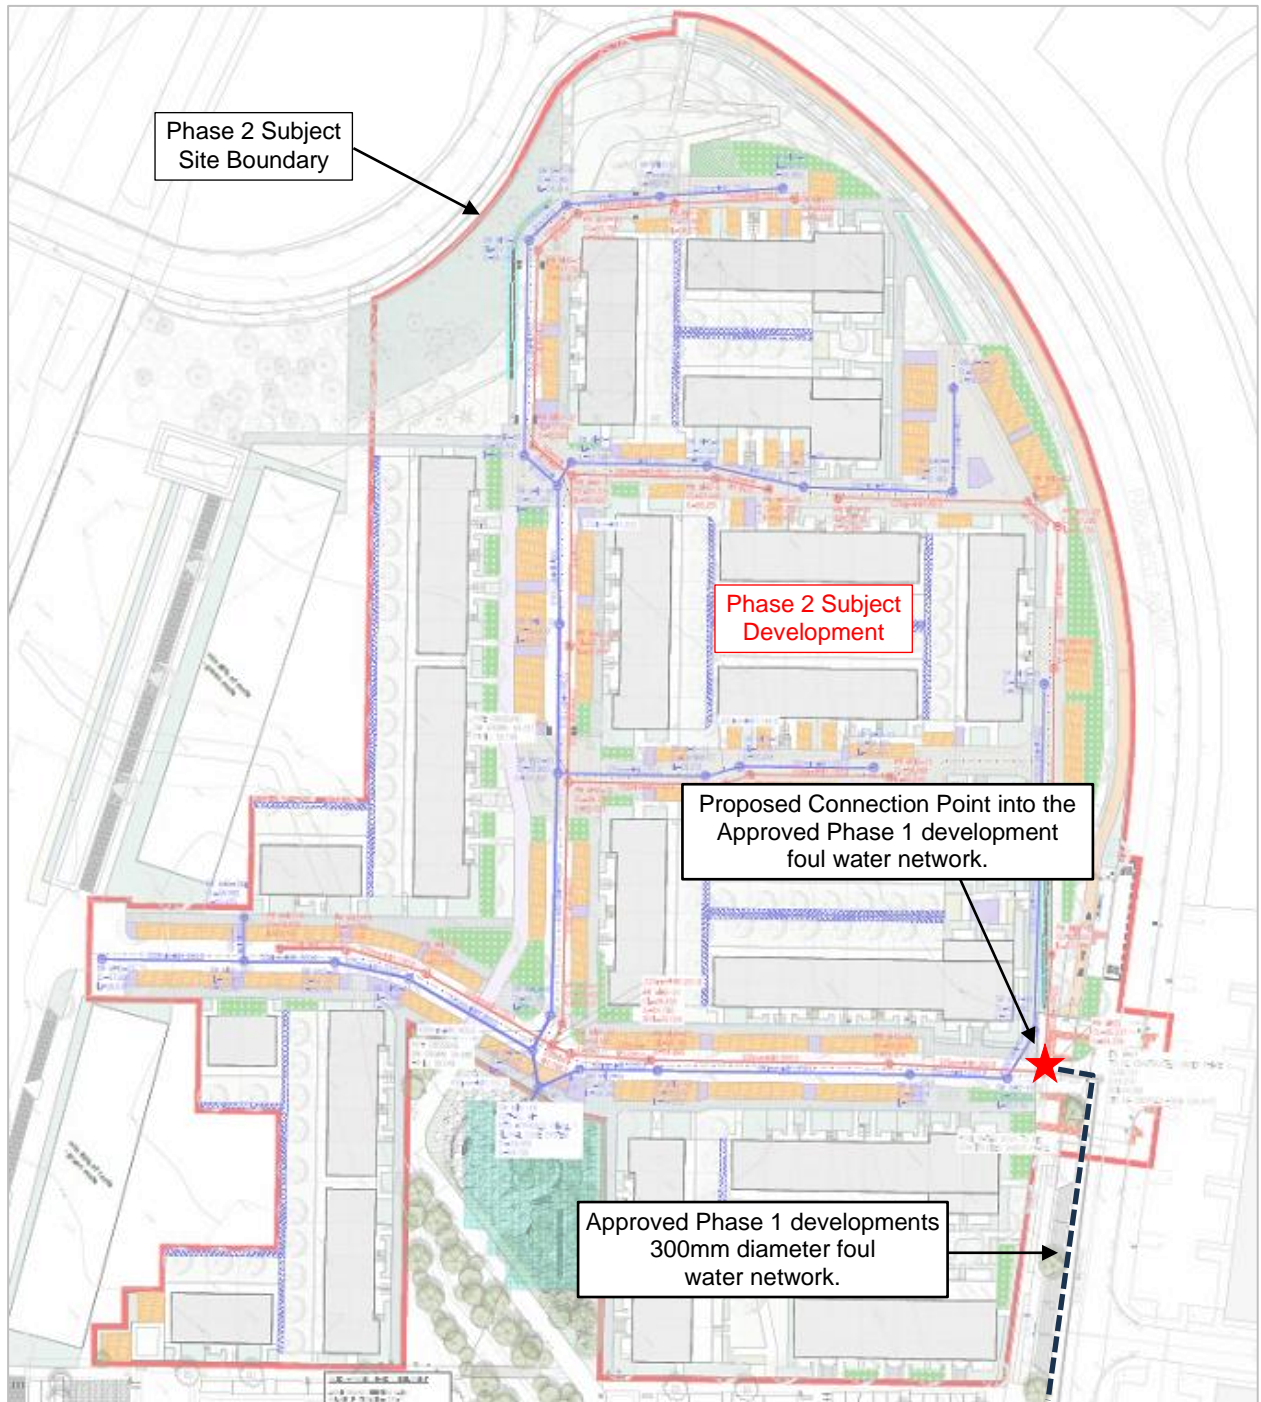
Subject Development's Proposed Foul Water Connection Point
